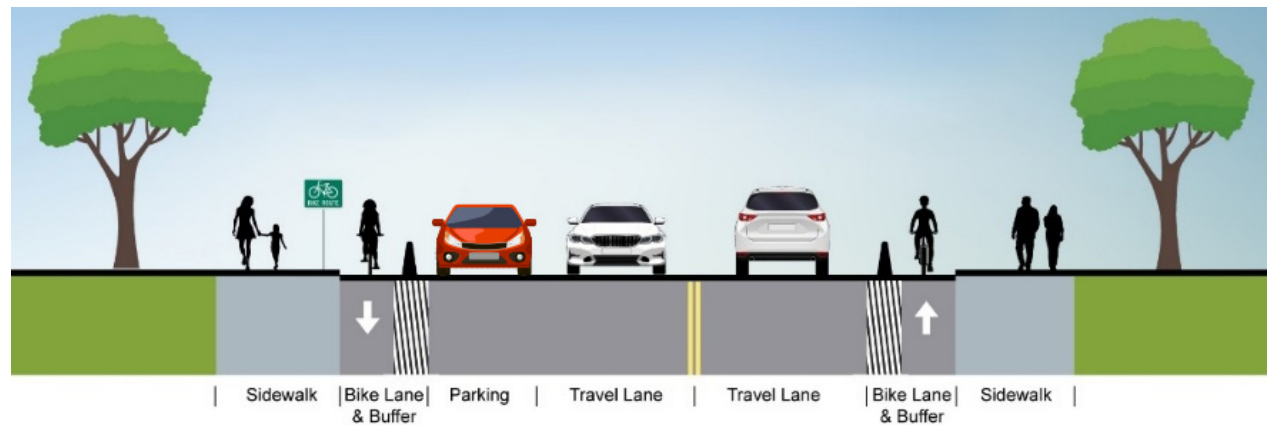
Typical cross-section of a street with one-way Class IV bike lanes on each side
